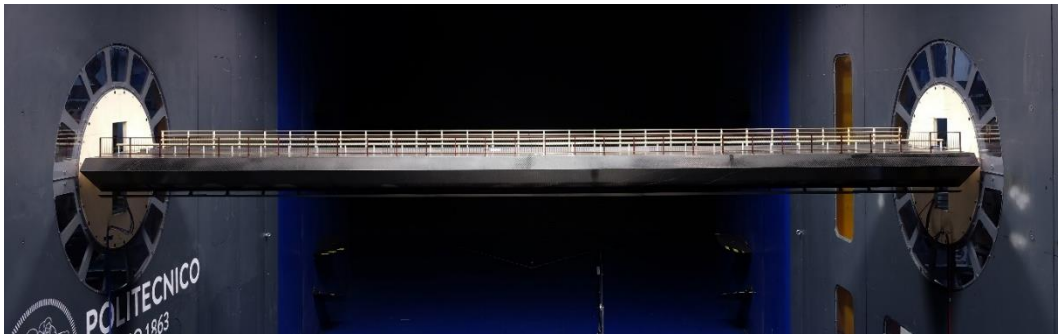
Upwind view of the Gjemnessund bridge deck sectional model positioned in the low-turbulence test section of the Politecnico di Milano wind tunnel.
